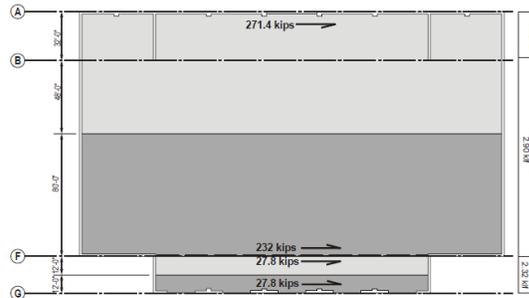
(a) Roof Diaphragm Earthquake Loads in East-West Direction
